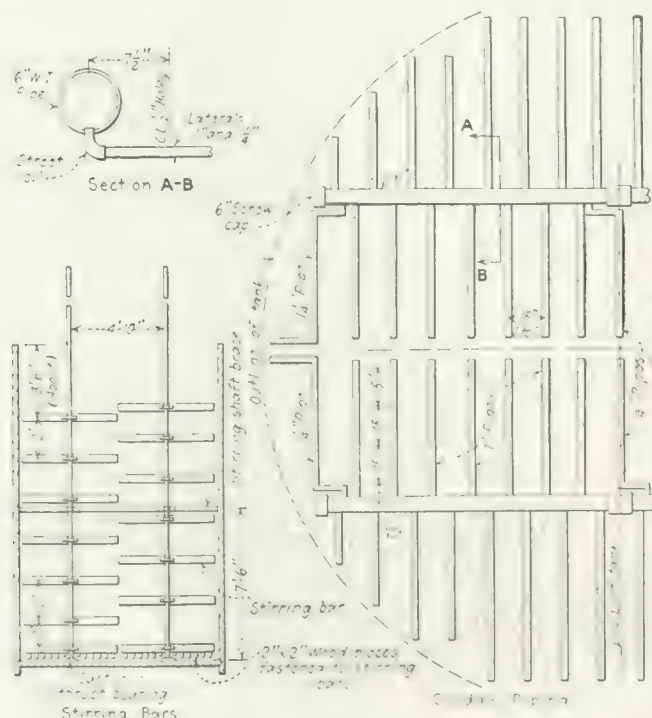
STIRRING APPARATUS AND SLUDGE PIPES
